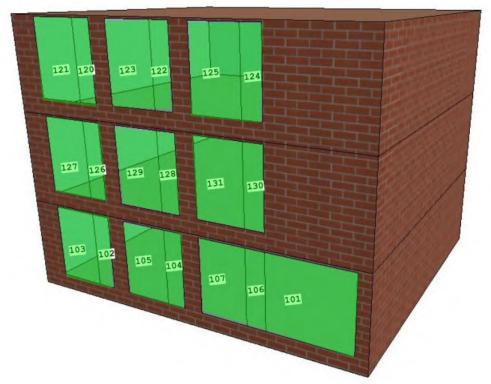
Window Maps of 32B Daleham Gardens (West Elevation)
